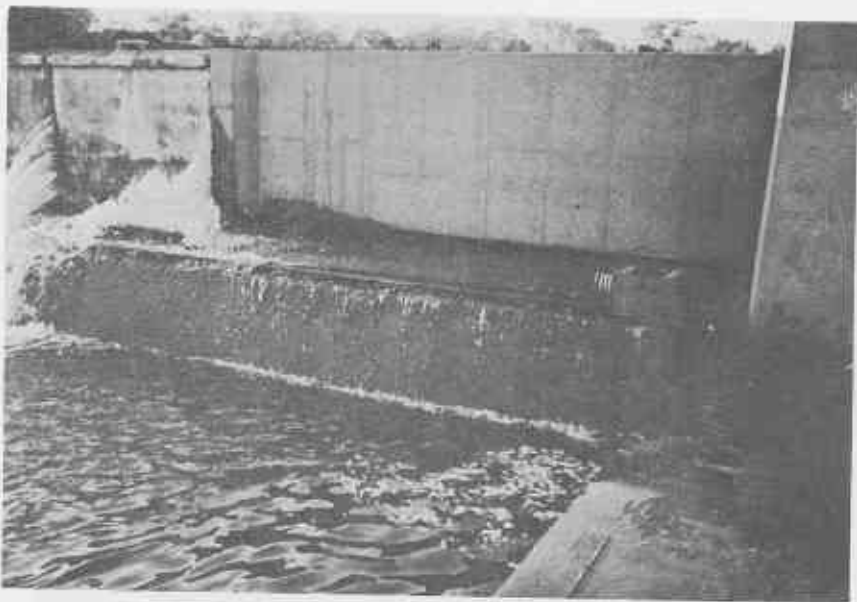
Fitzroy Barrage - Far or Right-hand Side
